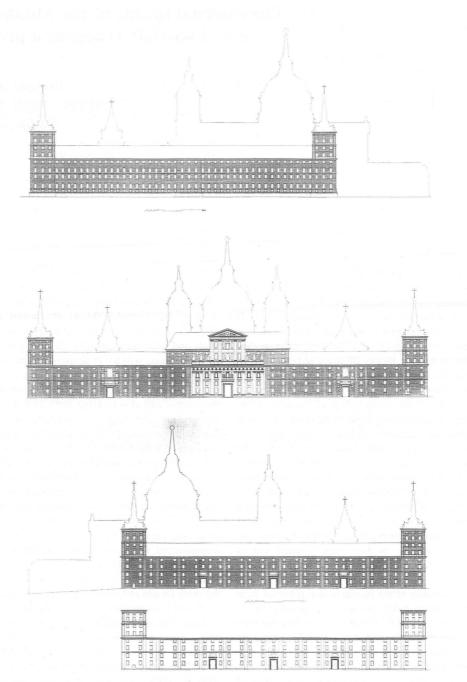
From top to bottom, the elevation work done on the south, west and north facades and the original distribution of the spaces and pilasters in the north façade
